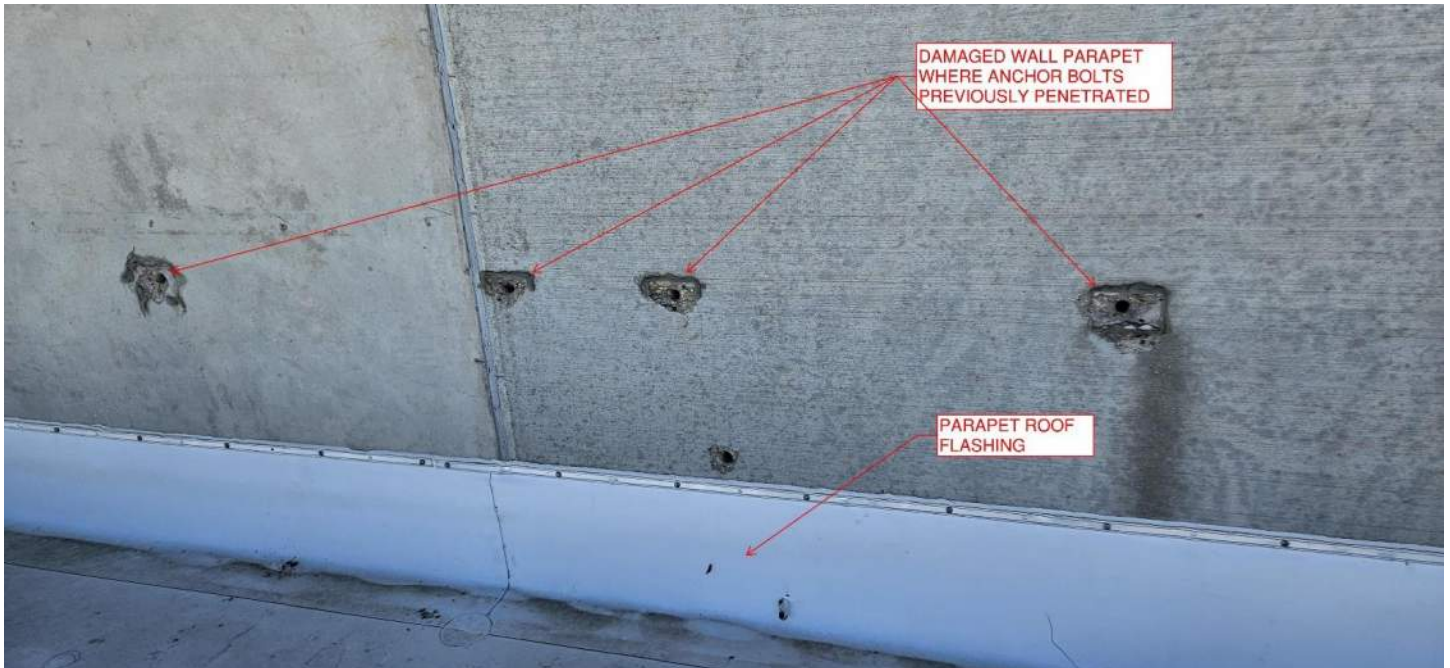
WALL PENETRATIONS AT THE EAST PARAPET
